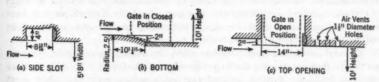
Nobris Dam Conduit Gate SLOTS
